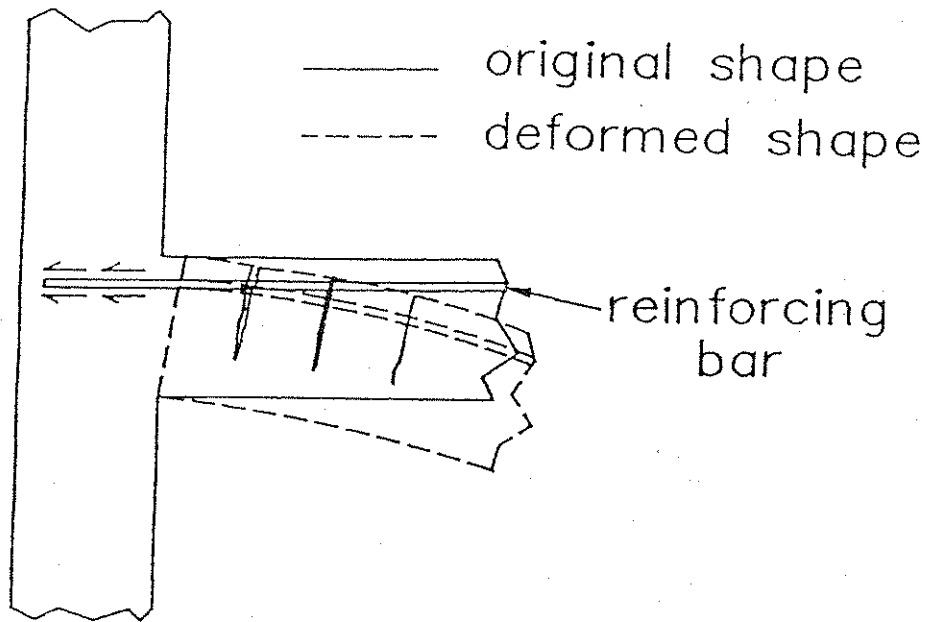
Bar Slip Mechanism in a Typical Reinforced Concrete Beam Element.
